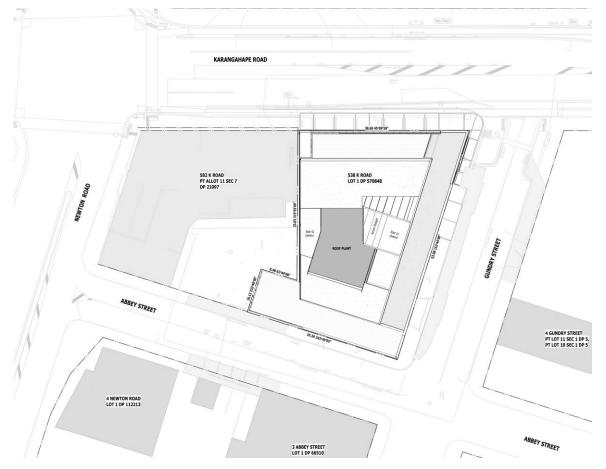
Site and Location Plan (Feron Hay Resource Consent Drawing (0)12 rev C)
